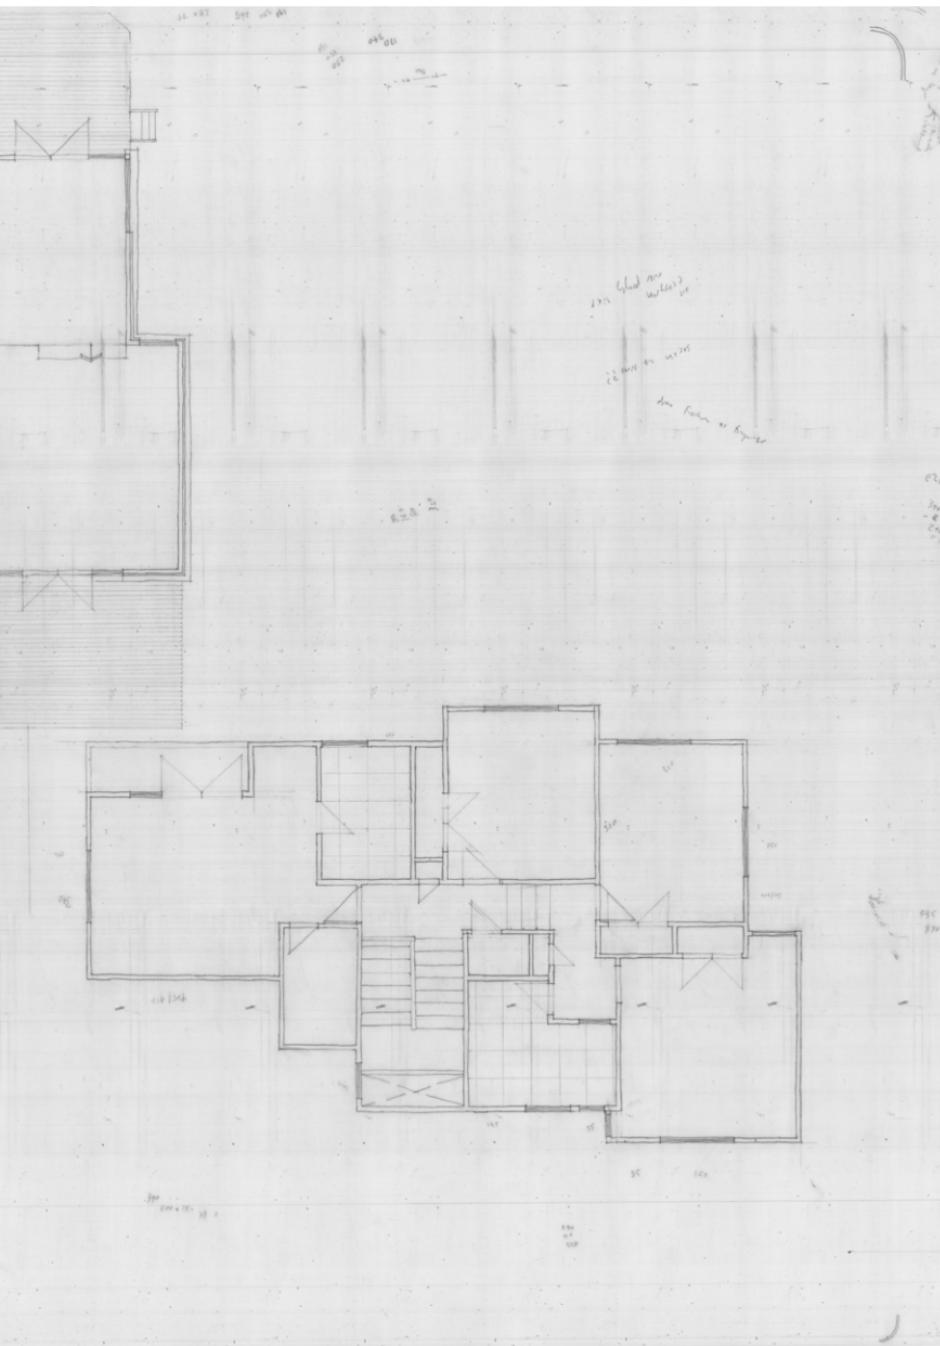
My second redrawing of the plans, altering them to match the house as it exists too
